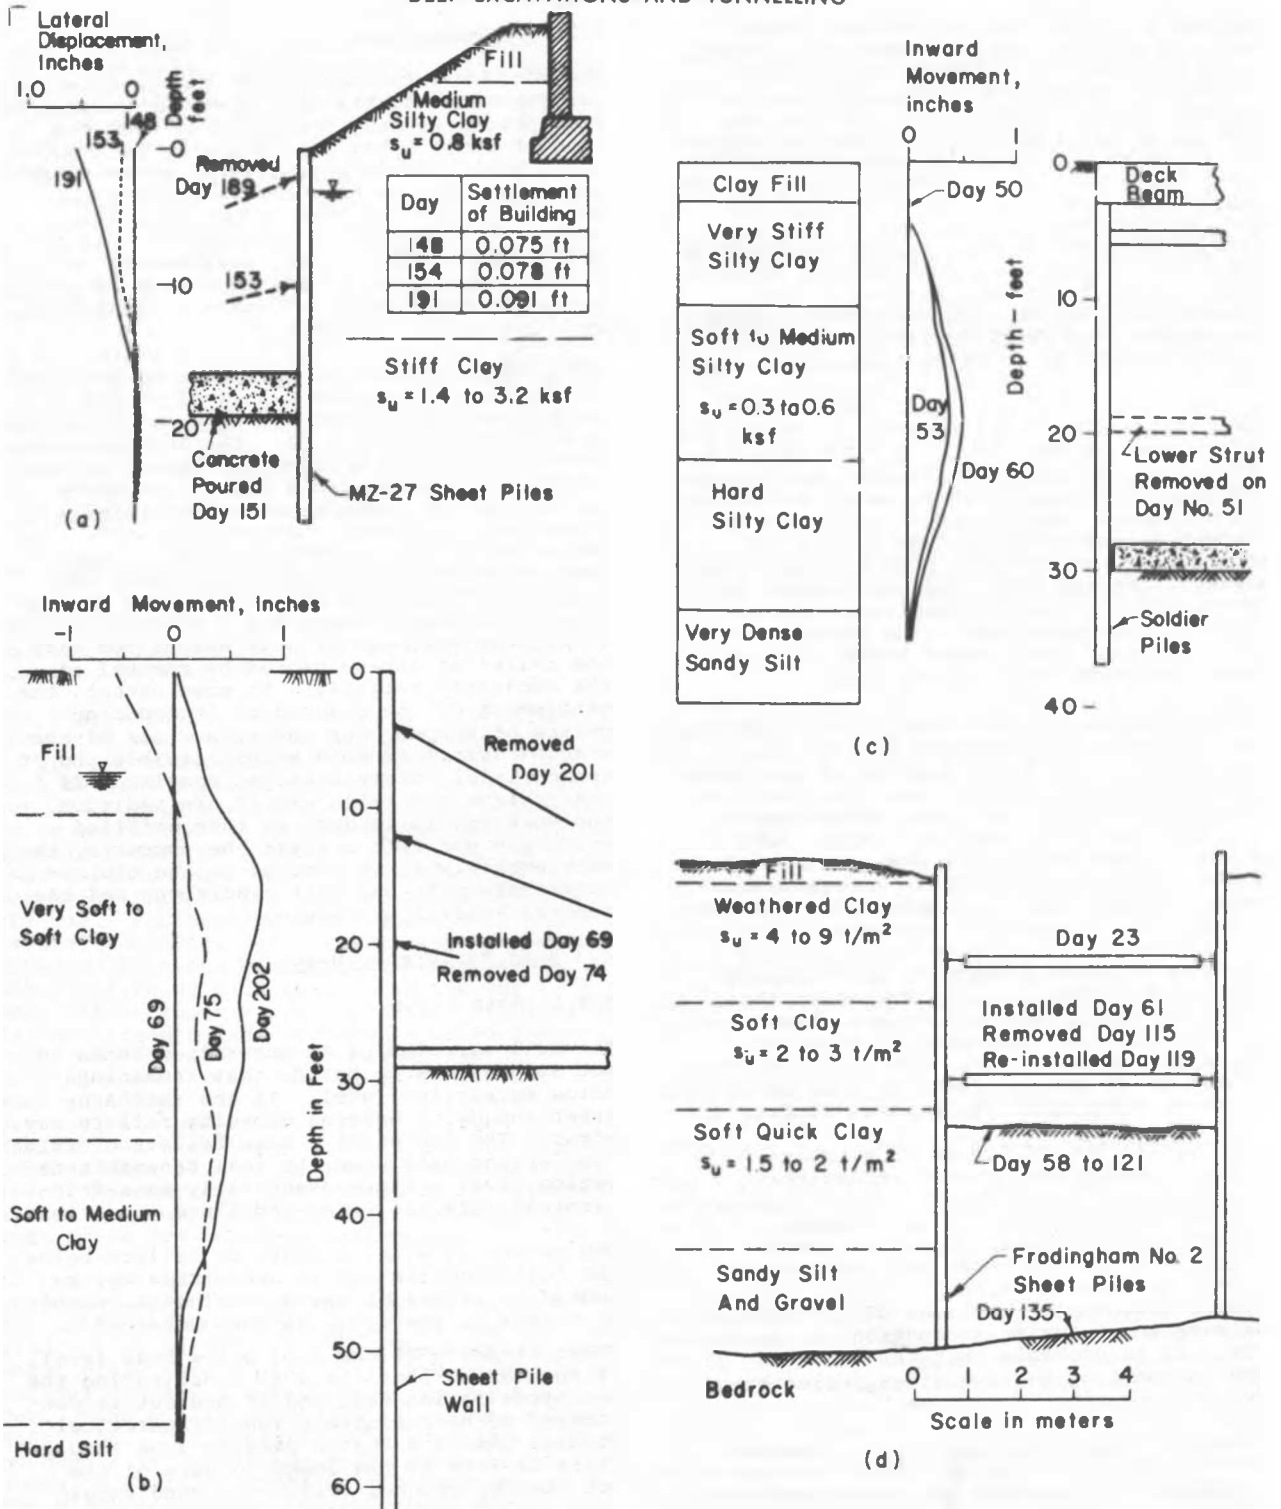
Lateral Displacements of Walls due to Removal of Struts in Various Open Cuts in Clay: (a) and (b) Raker-Supported Cuts in St. Louis and Chicago respectively; (c) Chicago Contract K5; (d) Telegraph Building, Oslo. Parts (a), (b) and (c) are drawn to the same scales.
